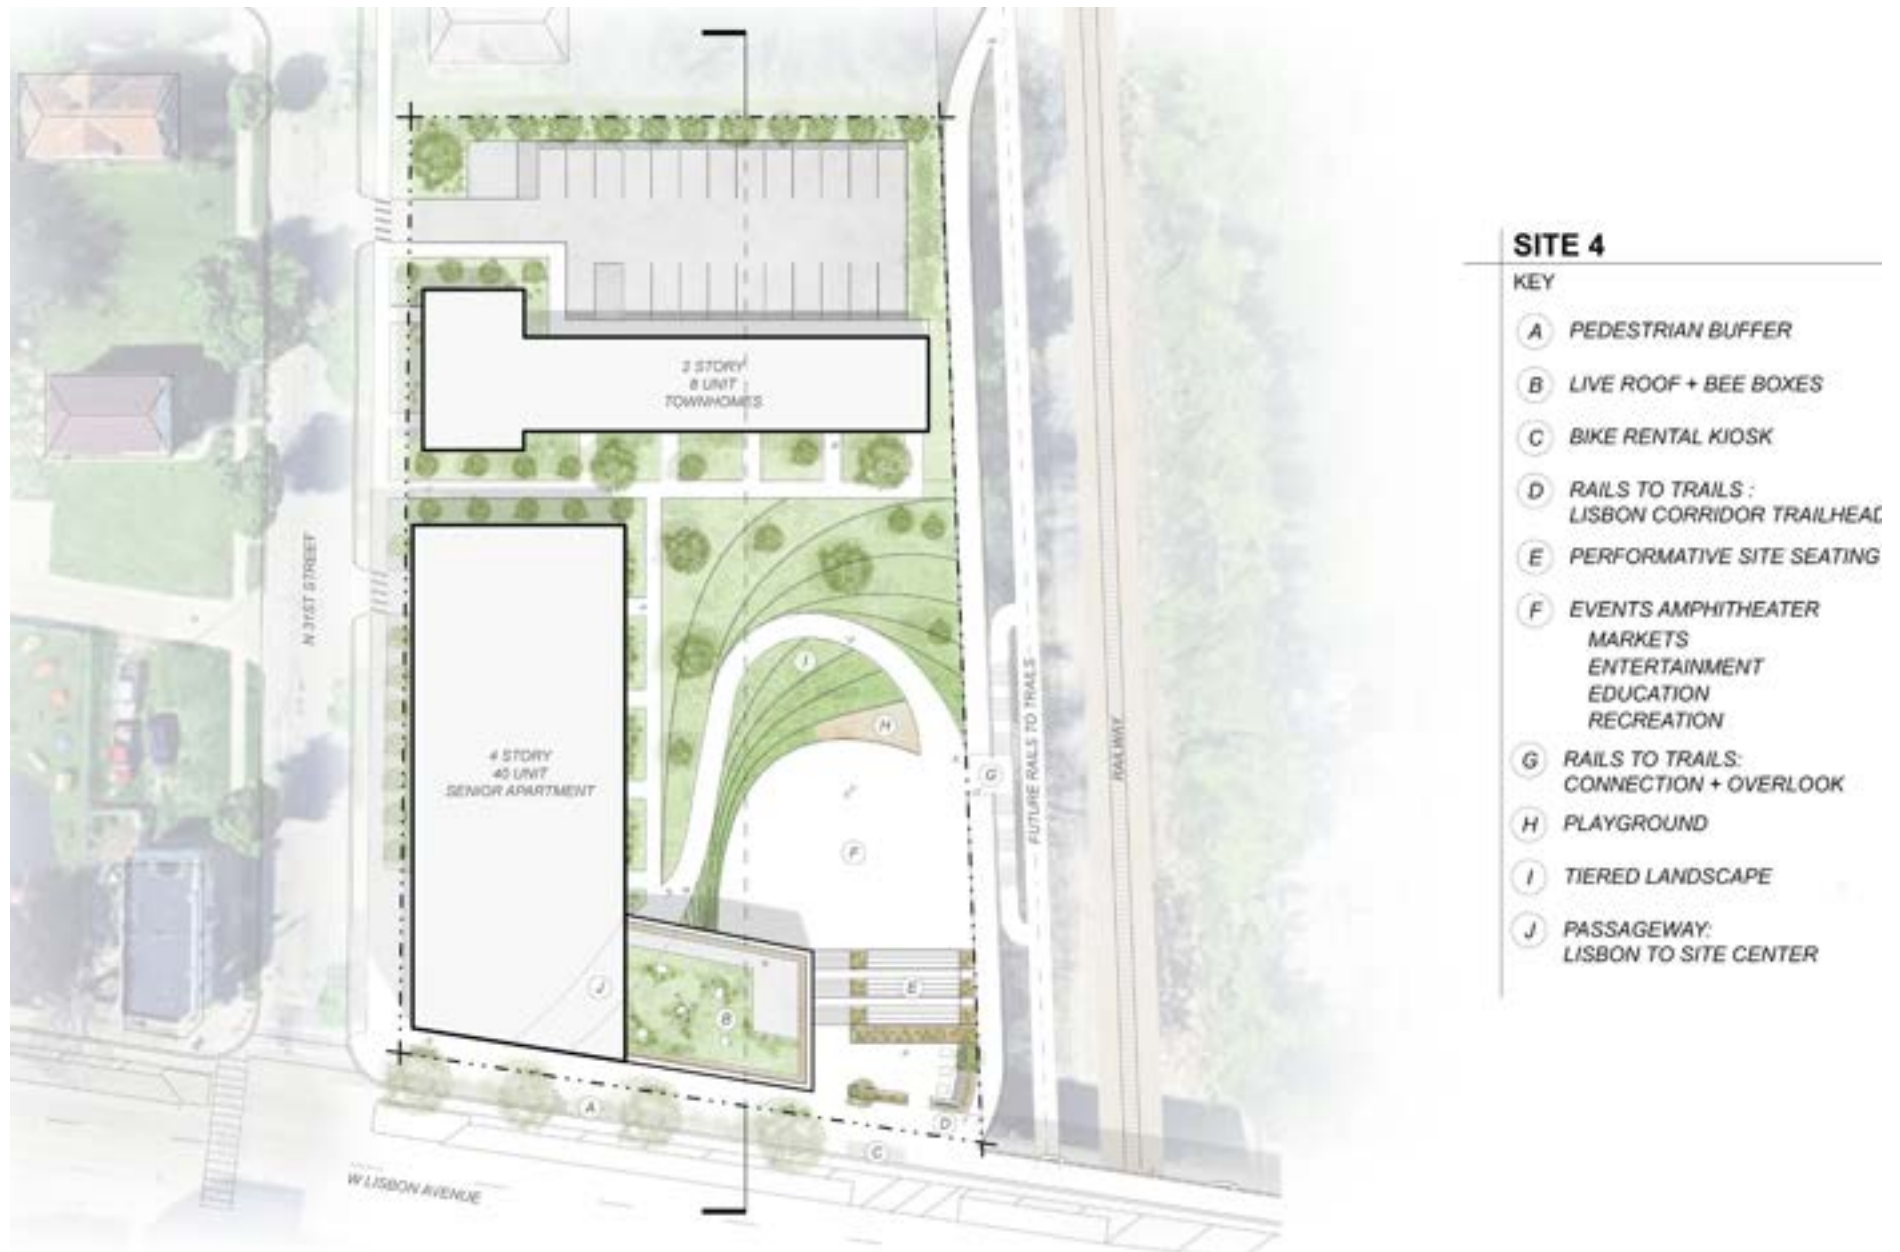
Site plan drawing showing building arrangement in relation to the public green.
